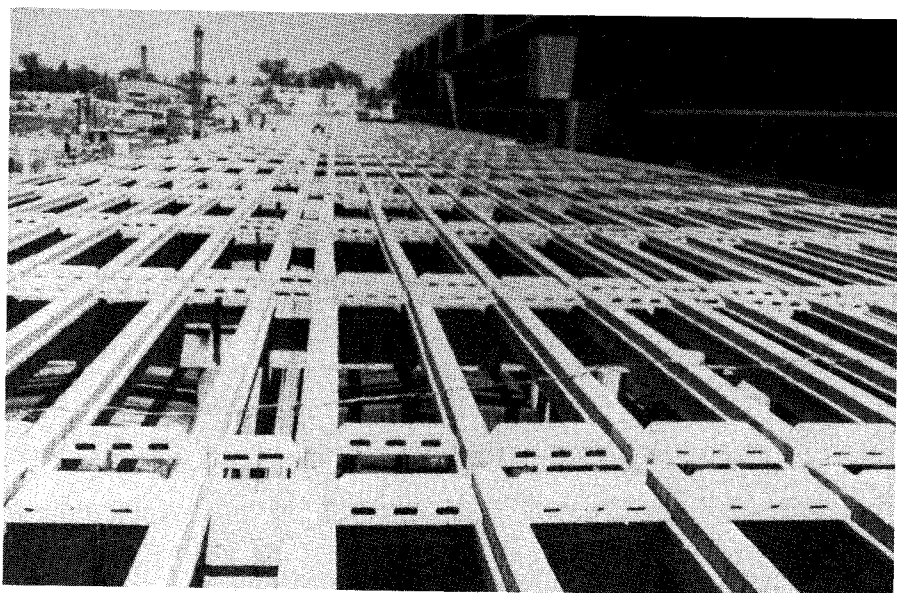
Prestressed block joist and filler construction on 100,000 sq ft (9290 m²) warehouse for Crosley Corporation. Joists are made continuous over 18 x 24-in. (457 x 610 mm) prestressed block beams by reinforcing steel in the topping slab.
